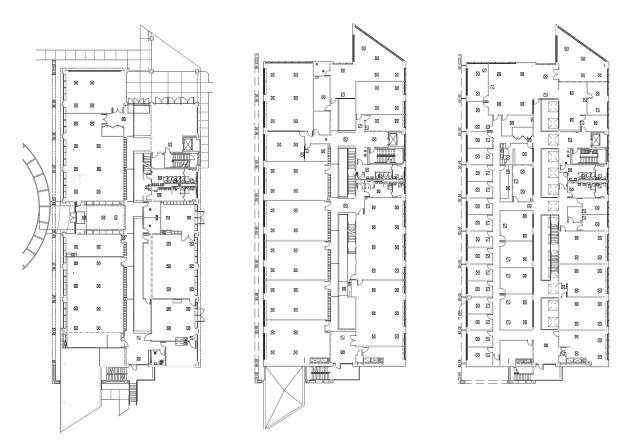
Building A ground, second, and third floor plans (USGBC,2008, Rinker Hall at the University of Florida)
